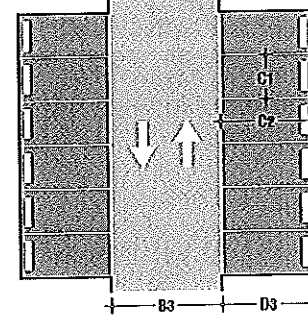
Parking Lot Stall, Aisle and Parking Bay Dimensions
